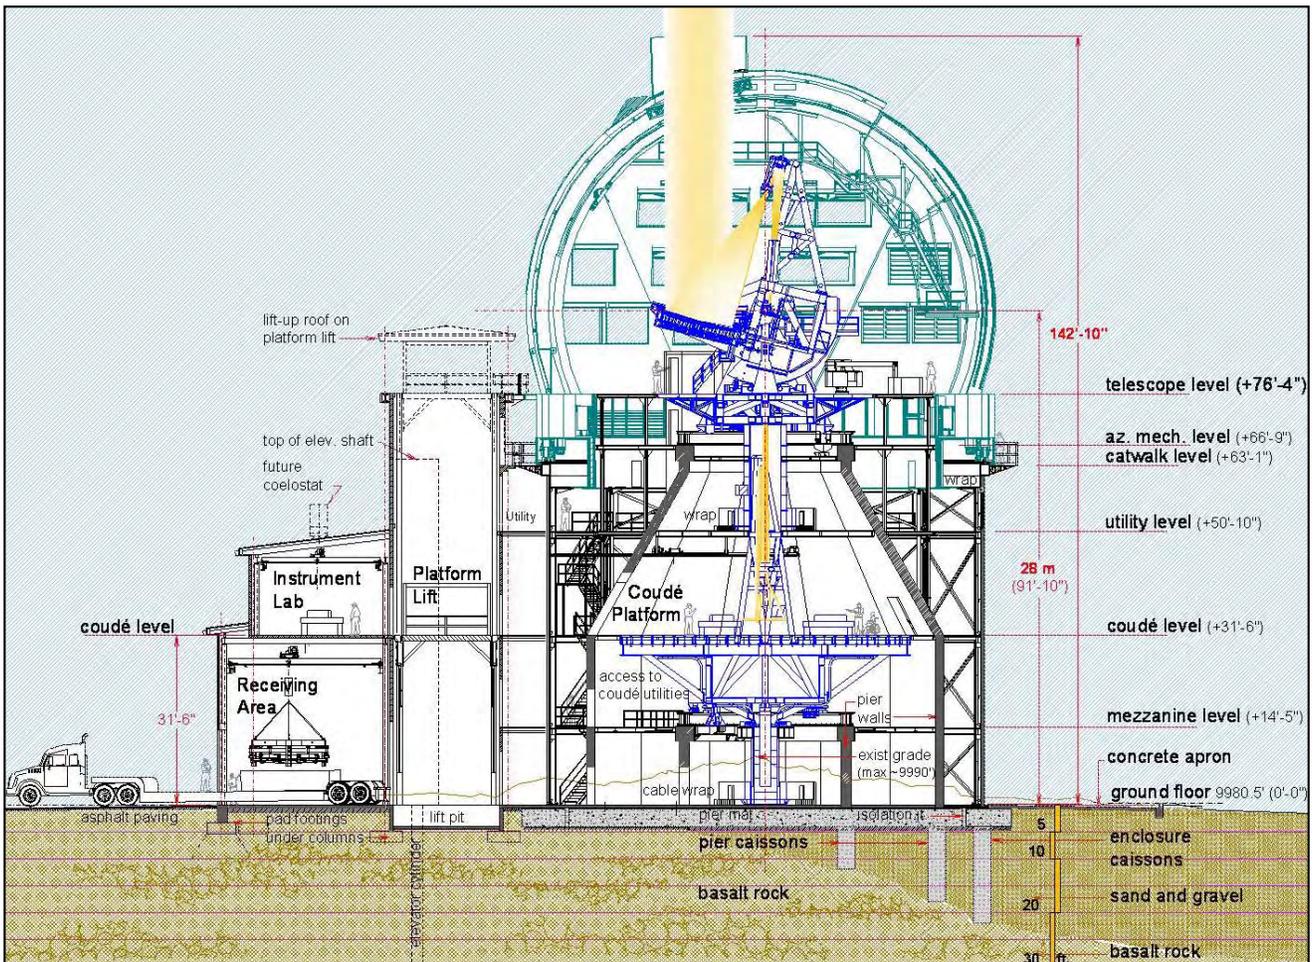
Proposed ATST Facility Section Drawing Showing Depth of Foundations in Relation to Building and Natural Rock
